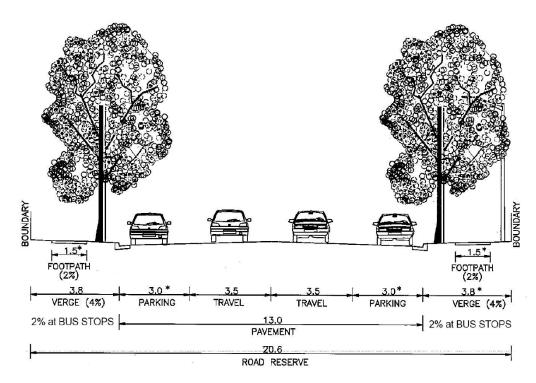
Industrial Road cross-section (Source: Penrith Development Control Plan)
